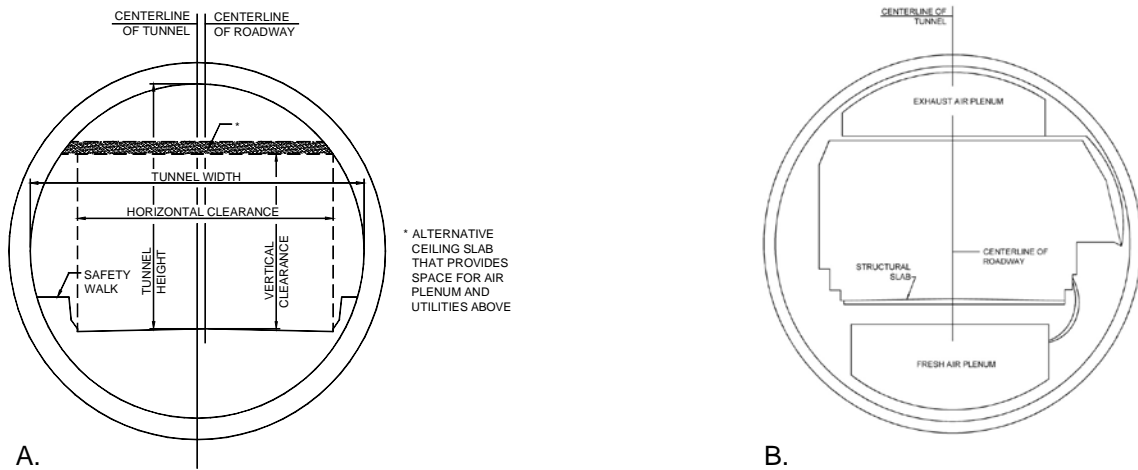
A) Circular tunnel with two traffic lanes and one safety walk with a slab-on-grade. B). Also shown is an alternative ceiling slab. Invert may be solid concrete or a structural slab that provides void space to meet ventilation and/or drainage requirements.
